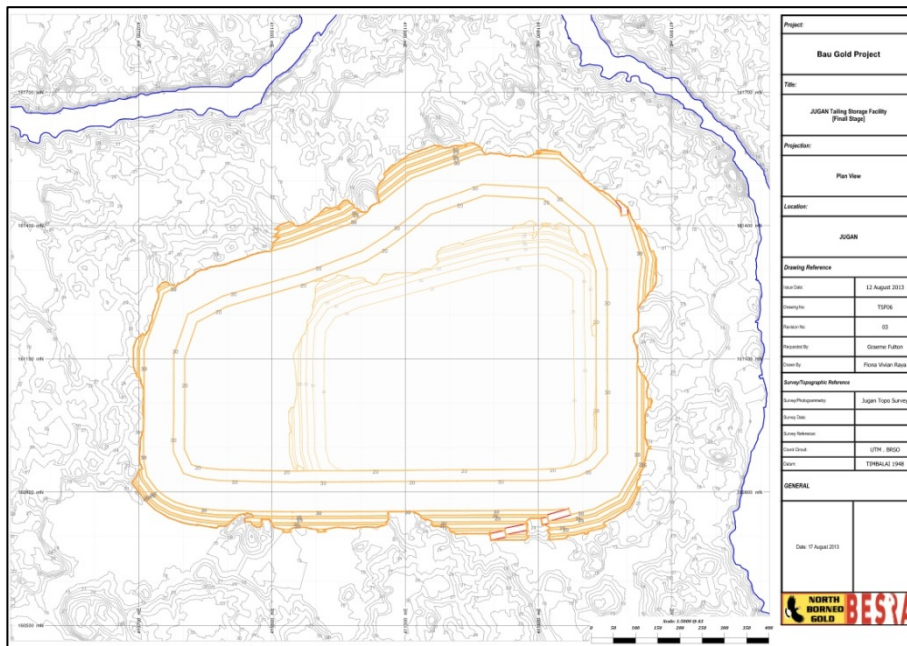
Plan View of Stage 2 of TSF at Jugan
